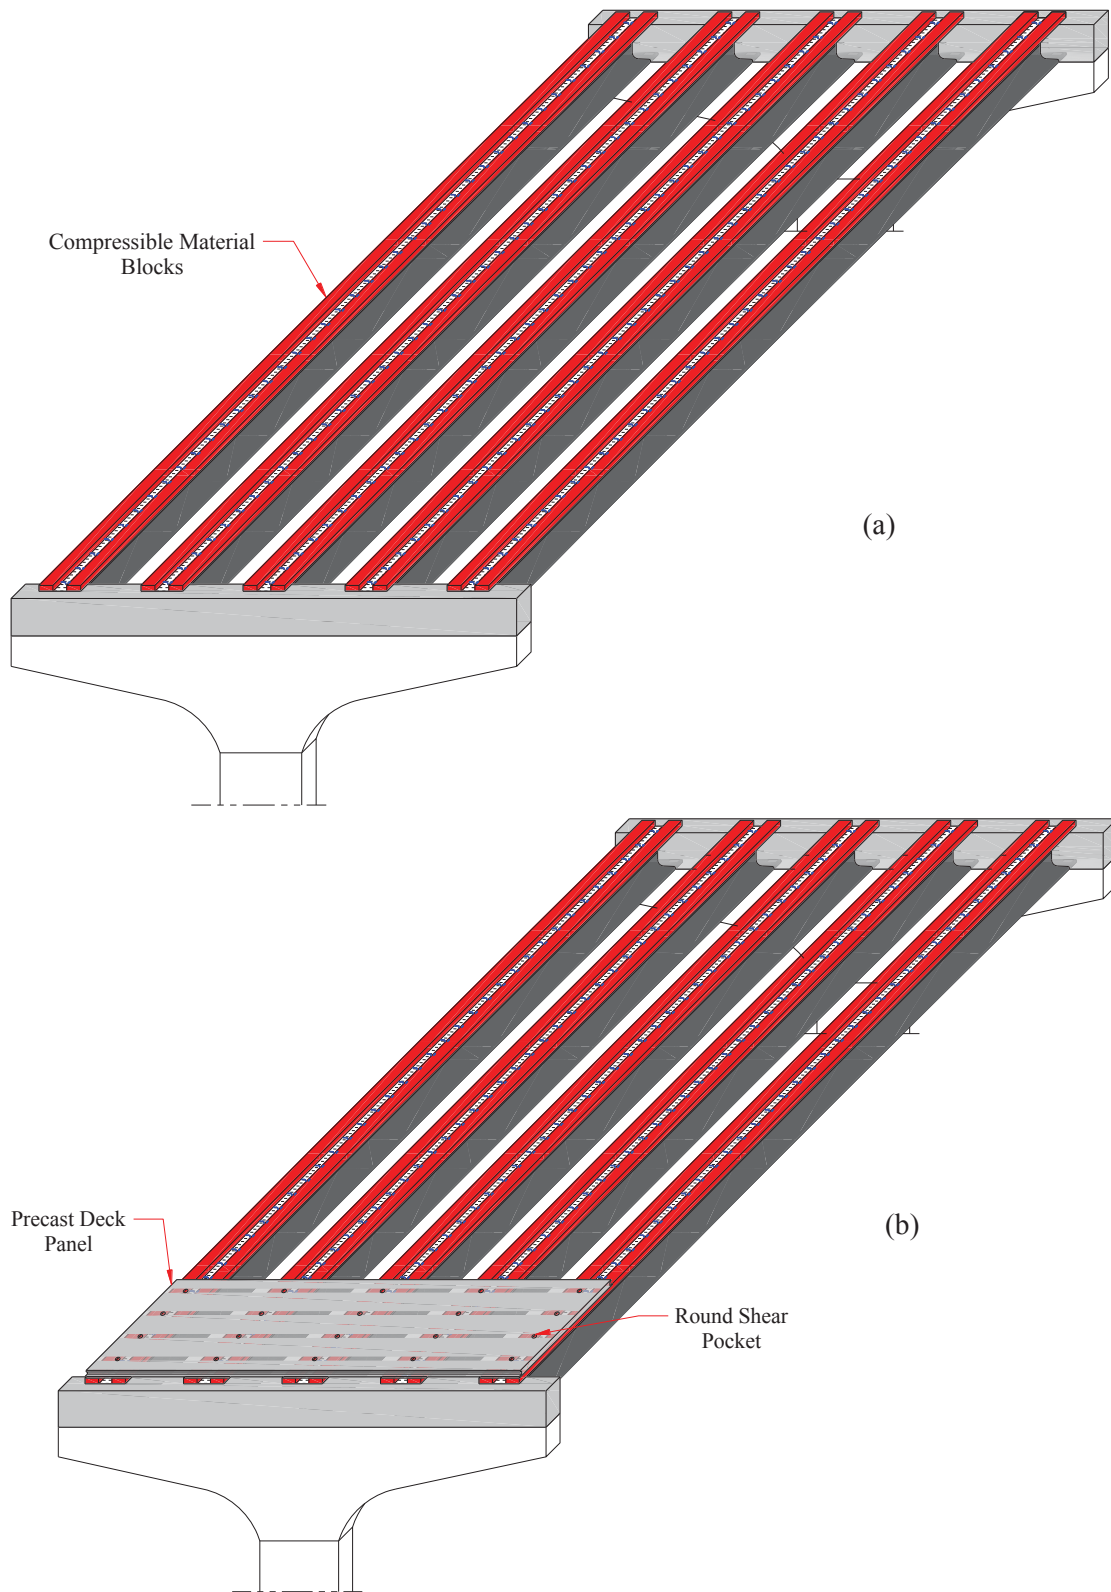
Construction Sequence of the Proposed Precast Concrete Deck-to-Concrete Girder Connection Using UHPC
